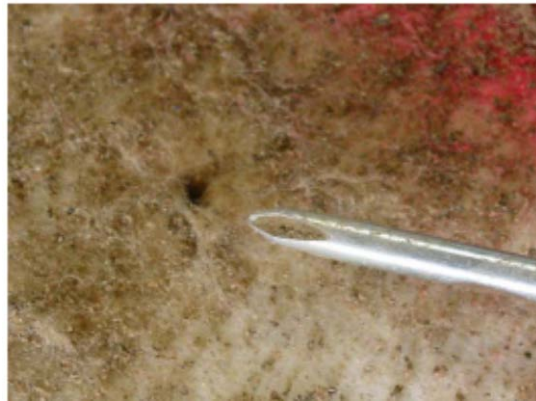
3 m drop height damage to nonwoven geotextile.
